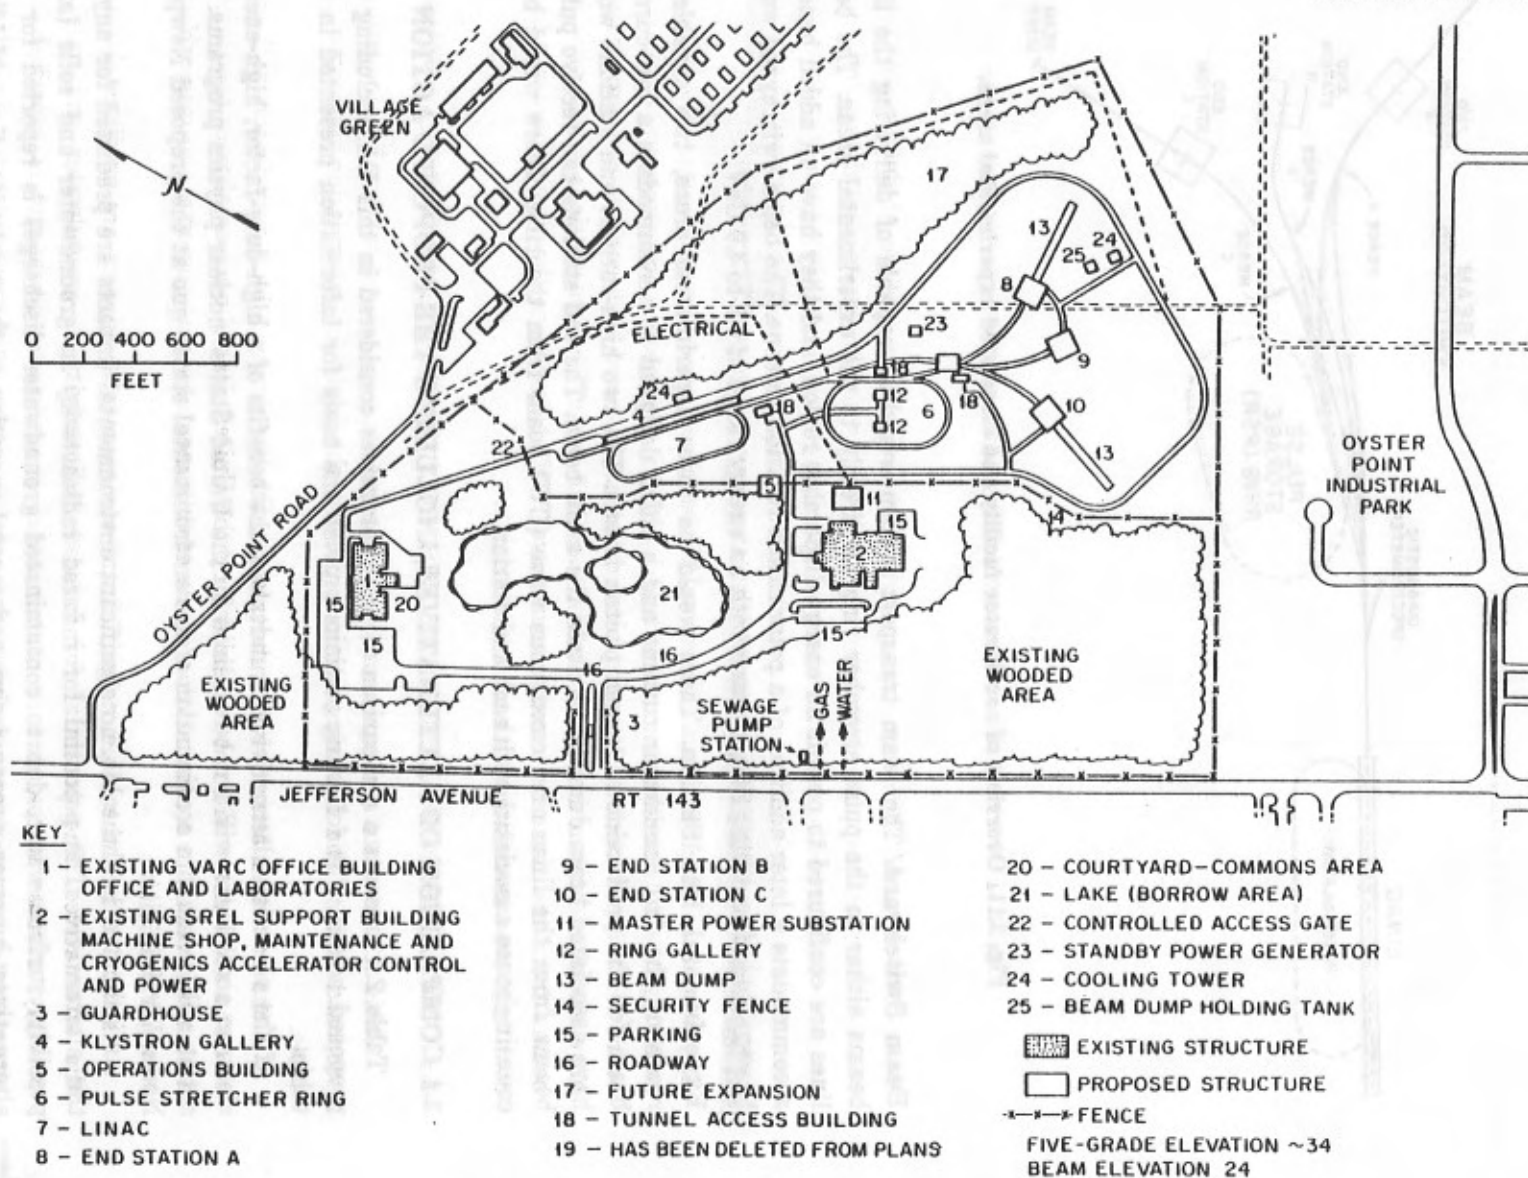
Site layout for the alternative CEBAF technology at Newport News, Virginia.
